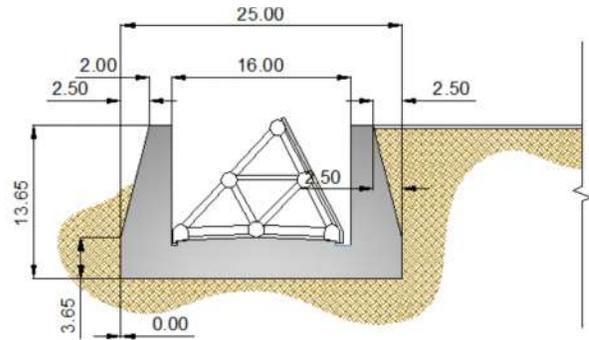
Chamber for Steel Barrier (Foundation piles not pictured)
